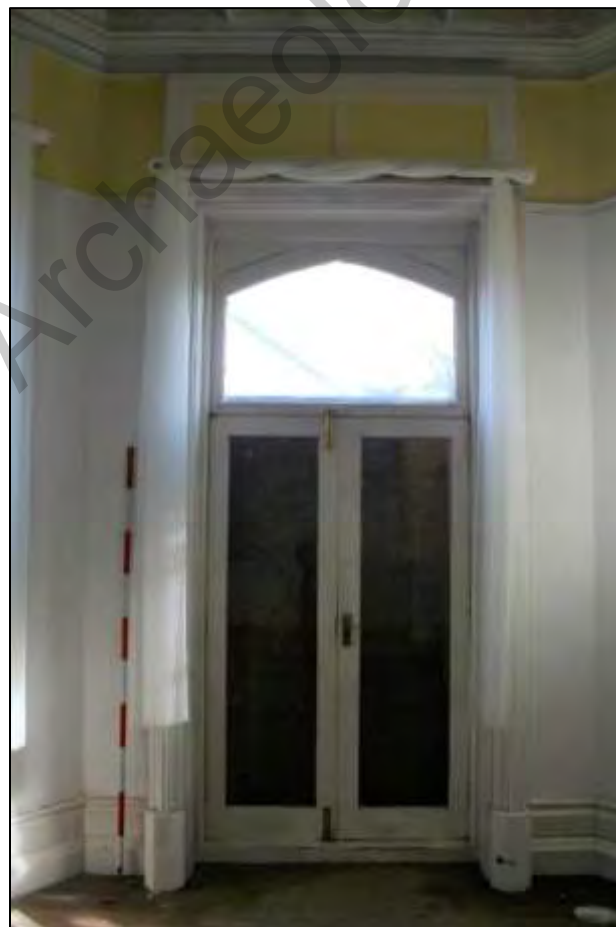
French doors to east wall of Room 4, view east. Scale 2m.
